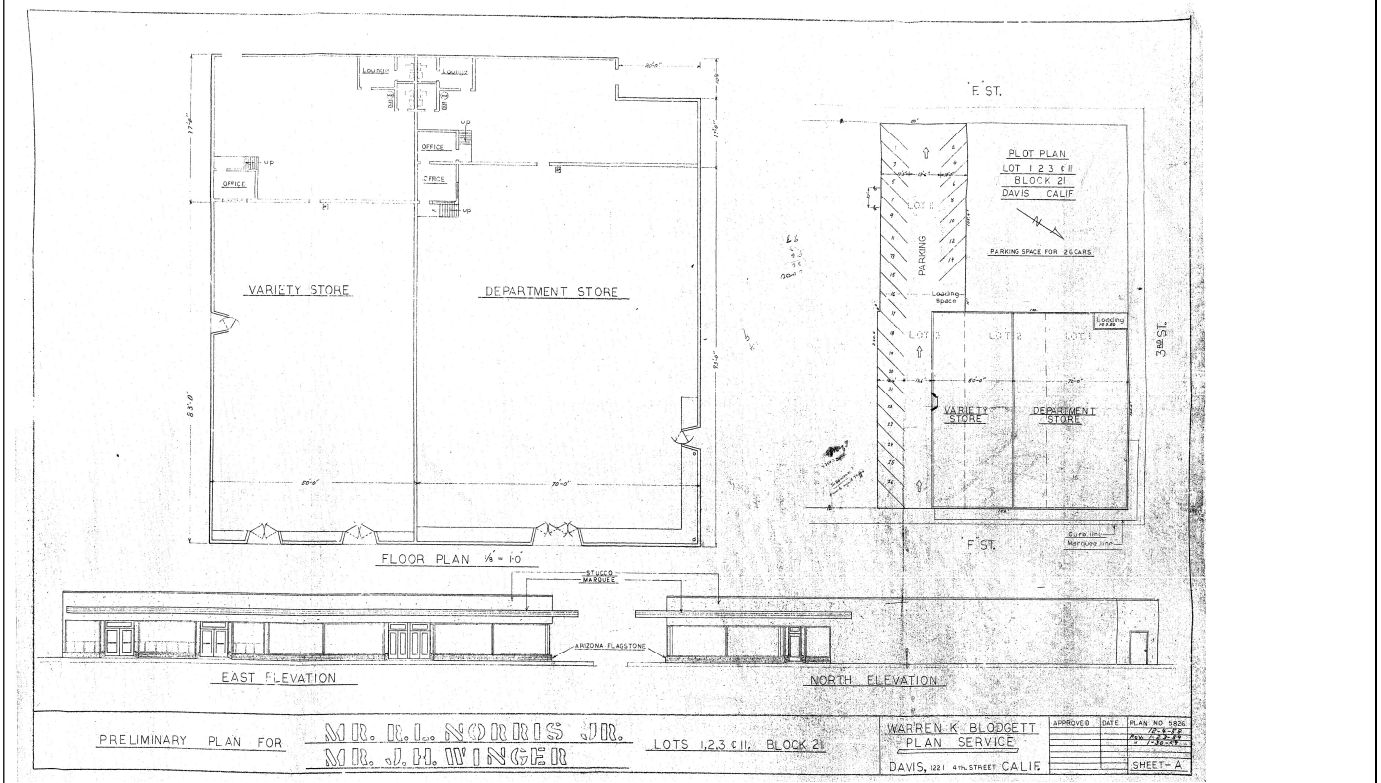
1959 Architectural plans for the Winger – Norris Building
